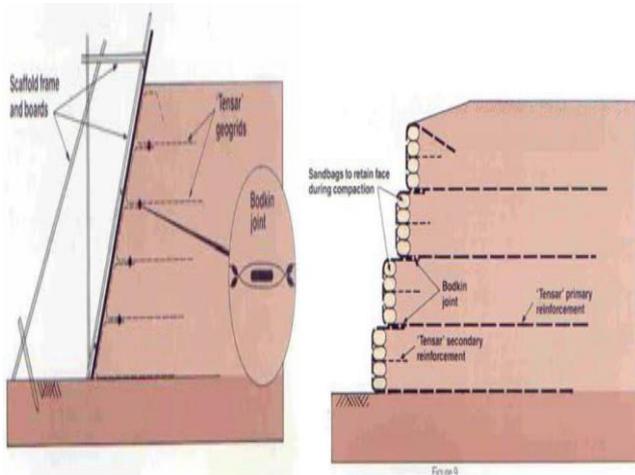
Scaffold frame, Sand Bags (Soft Facing)
